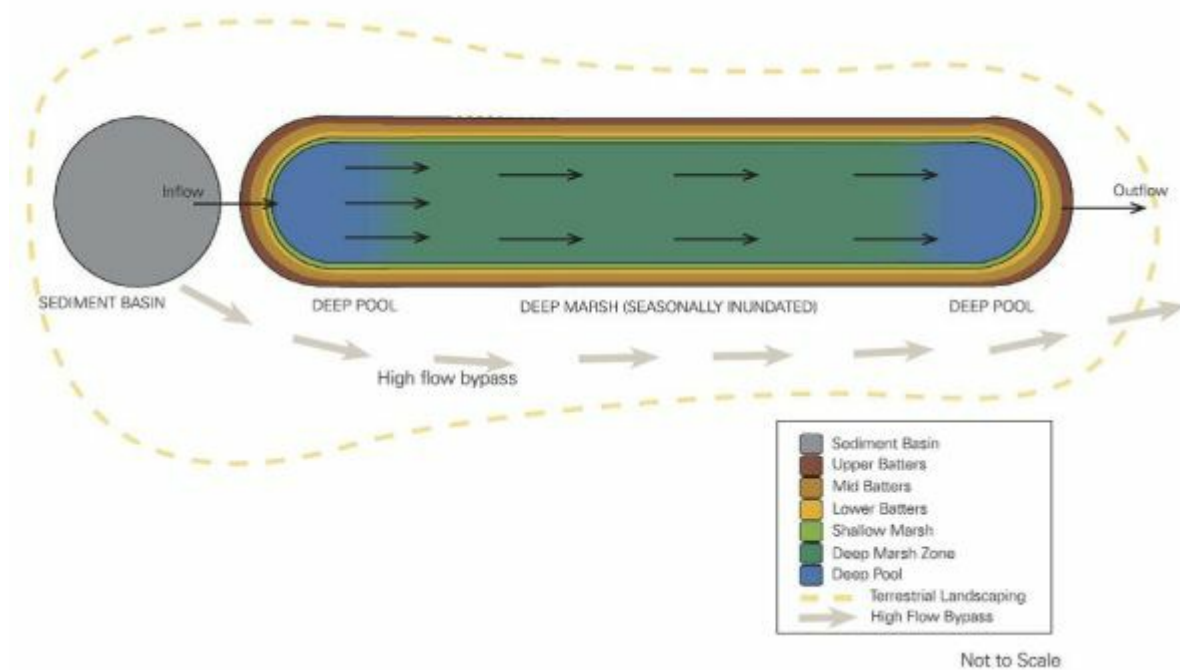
Schematic layout of a constructed wetland system
